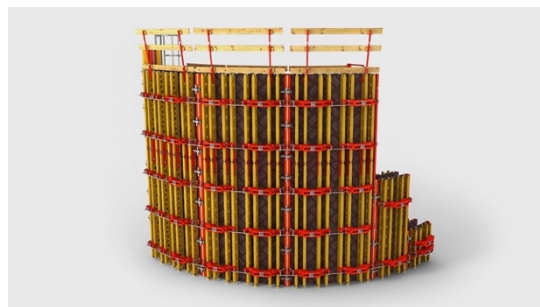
RUNDFLEX wall formwork with adjustable radius (product by Peri).
